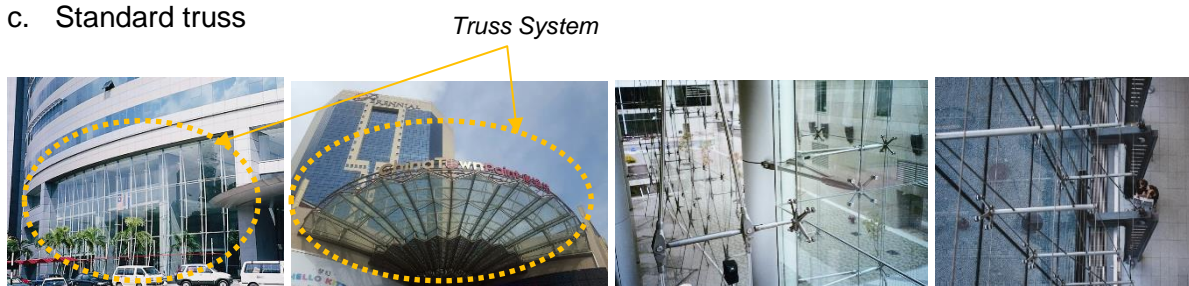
Bow Truss System Figure 59 Truss System Figure 60 Cable Truss Figure 61 Hanging Truss
